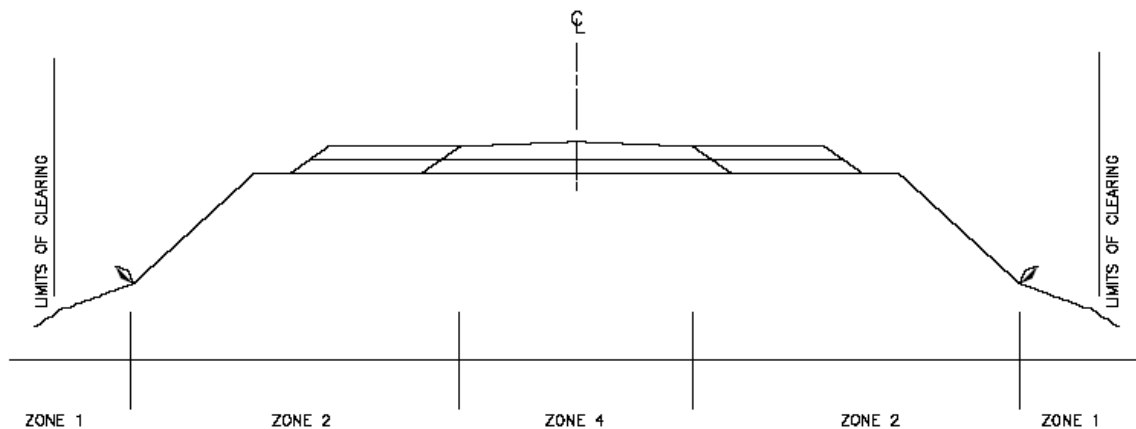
Roadway BMP and LID Zones for Fill Sections.
